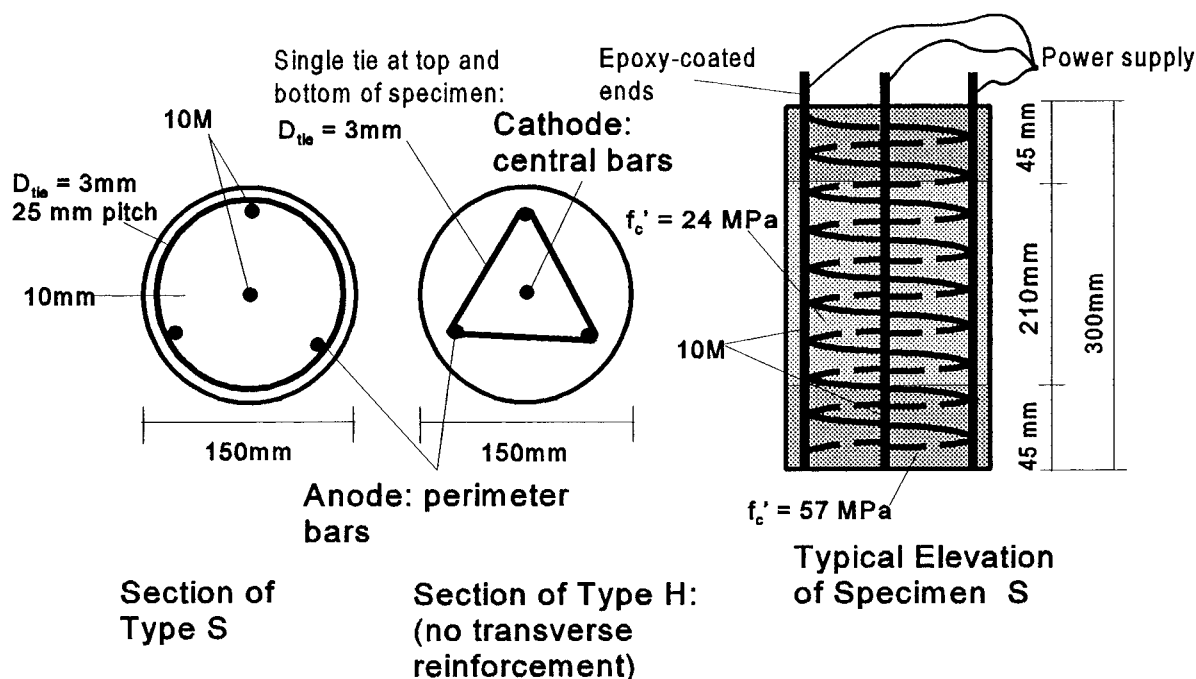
Typical Specimen Geometry: (a) S-Series; (b) H-Series
